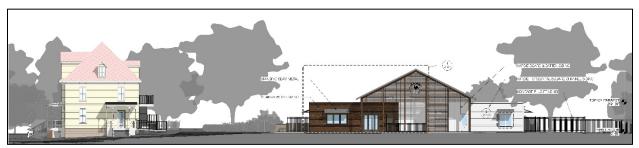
North Elevation from Parking Lot of Daycare Center and Historical Structure
